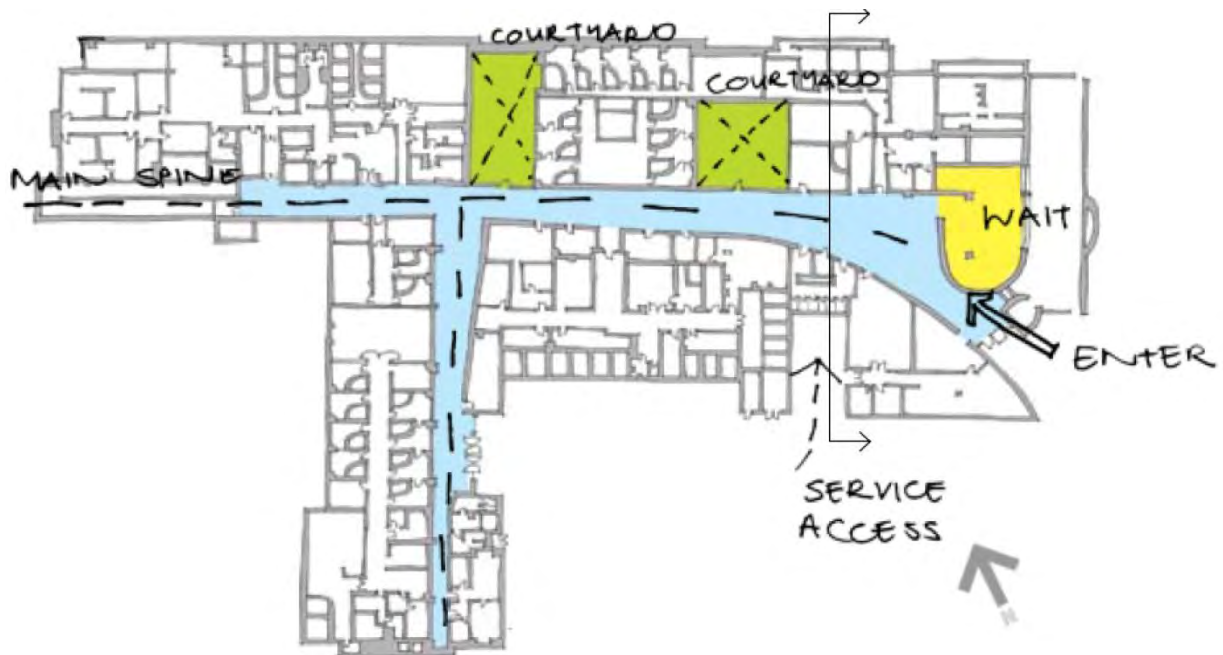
Ground floor plan indicating waiting area, circulation and internal courtyards.
